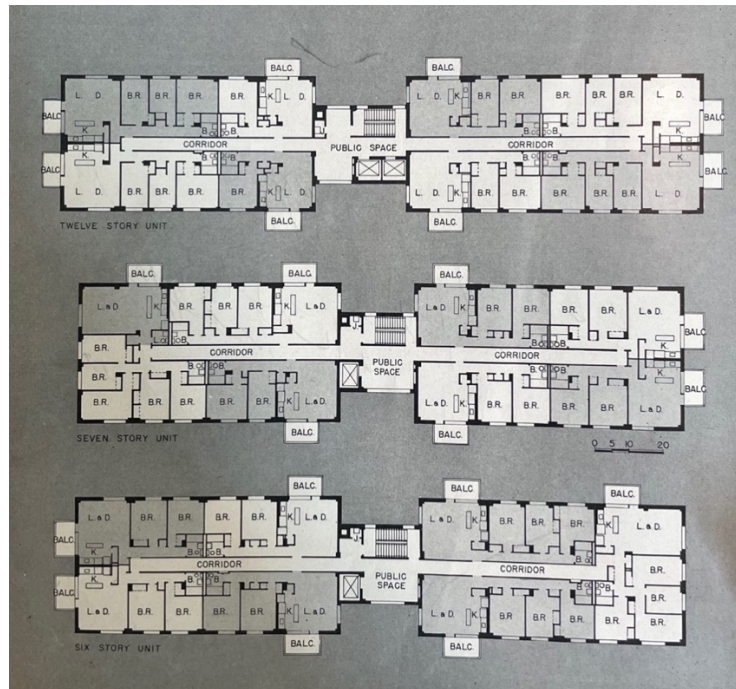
Typical layouts of upper floors in each type of building. Source: *Architectural Forum*, January 1952.
